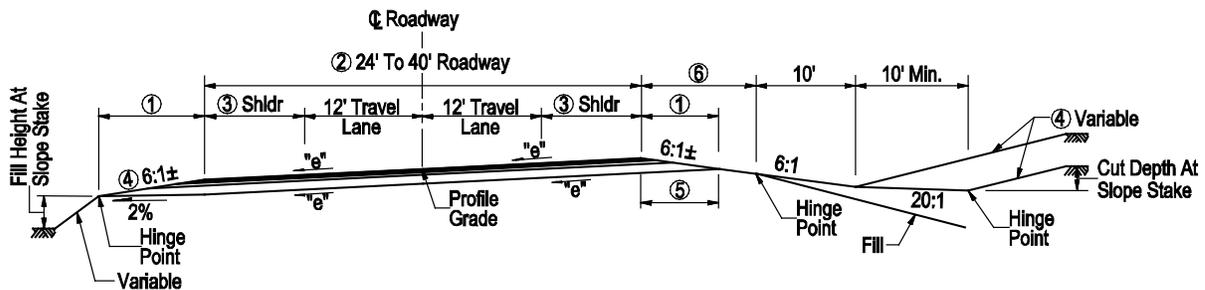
Typical Two Lane Roadway (Tangent Section)
